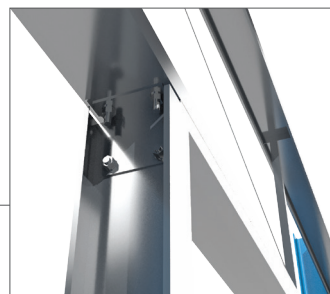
Detail of the window framing section connection by means of a connecting angle (TC).
